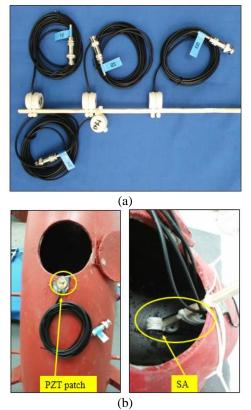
Transducer installation: (a) SAs supported with a wood stick and (b) A photo of mounted PZT patch and installed SAs
